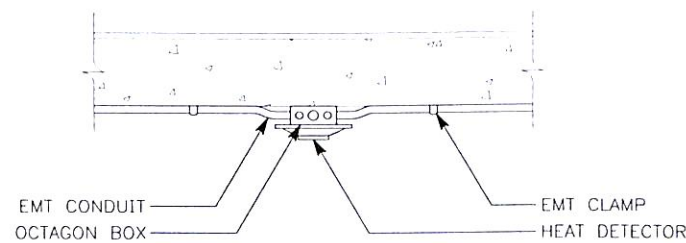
DETAIL : CONDUIT & SQUARE BOX INSTALLATION (TYP)
